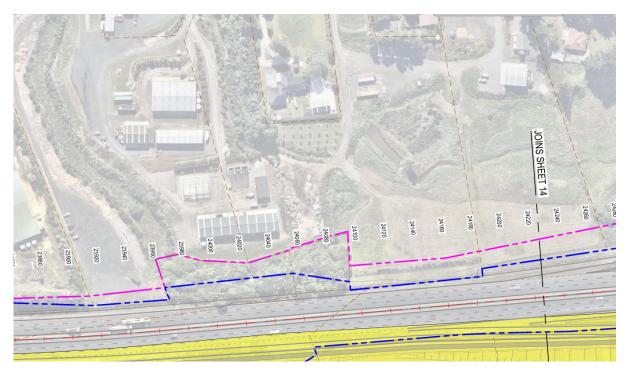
extract from Designation Layout Plans Sheet 13 showing submitter's land and general layout.
